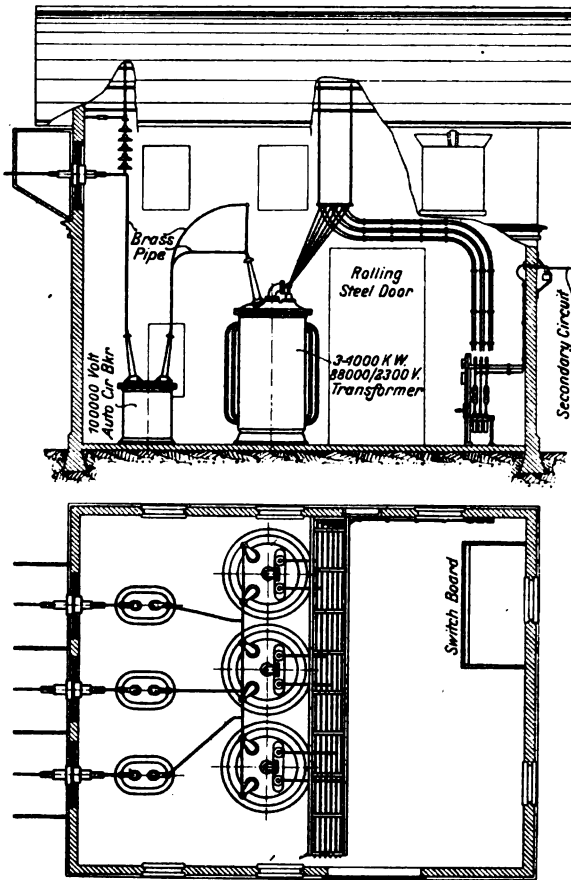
Elevation and Plan of a 3000-Kw, 100,000-Volt Substation.
